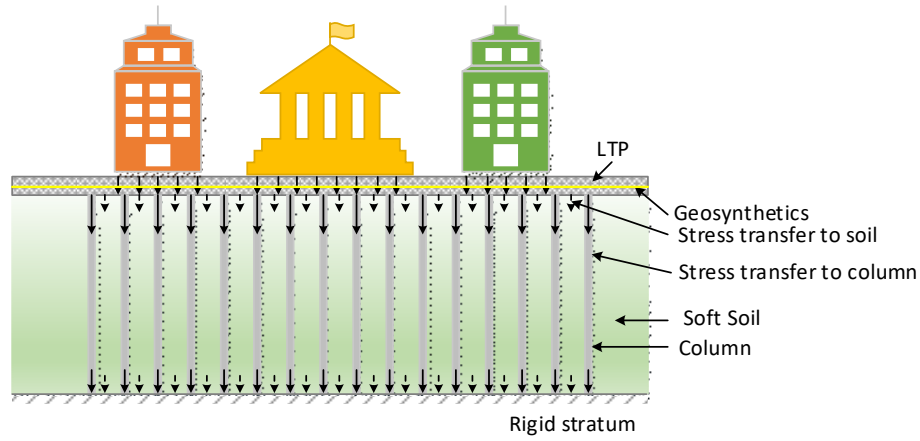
Load transfer mechanism of concrete injected columns-supported structures.
